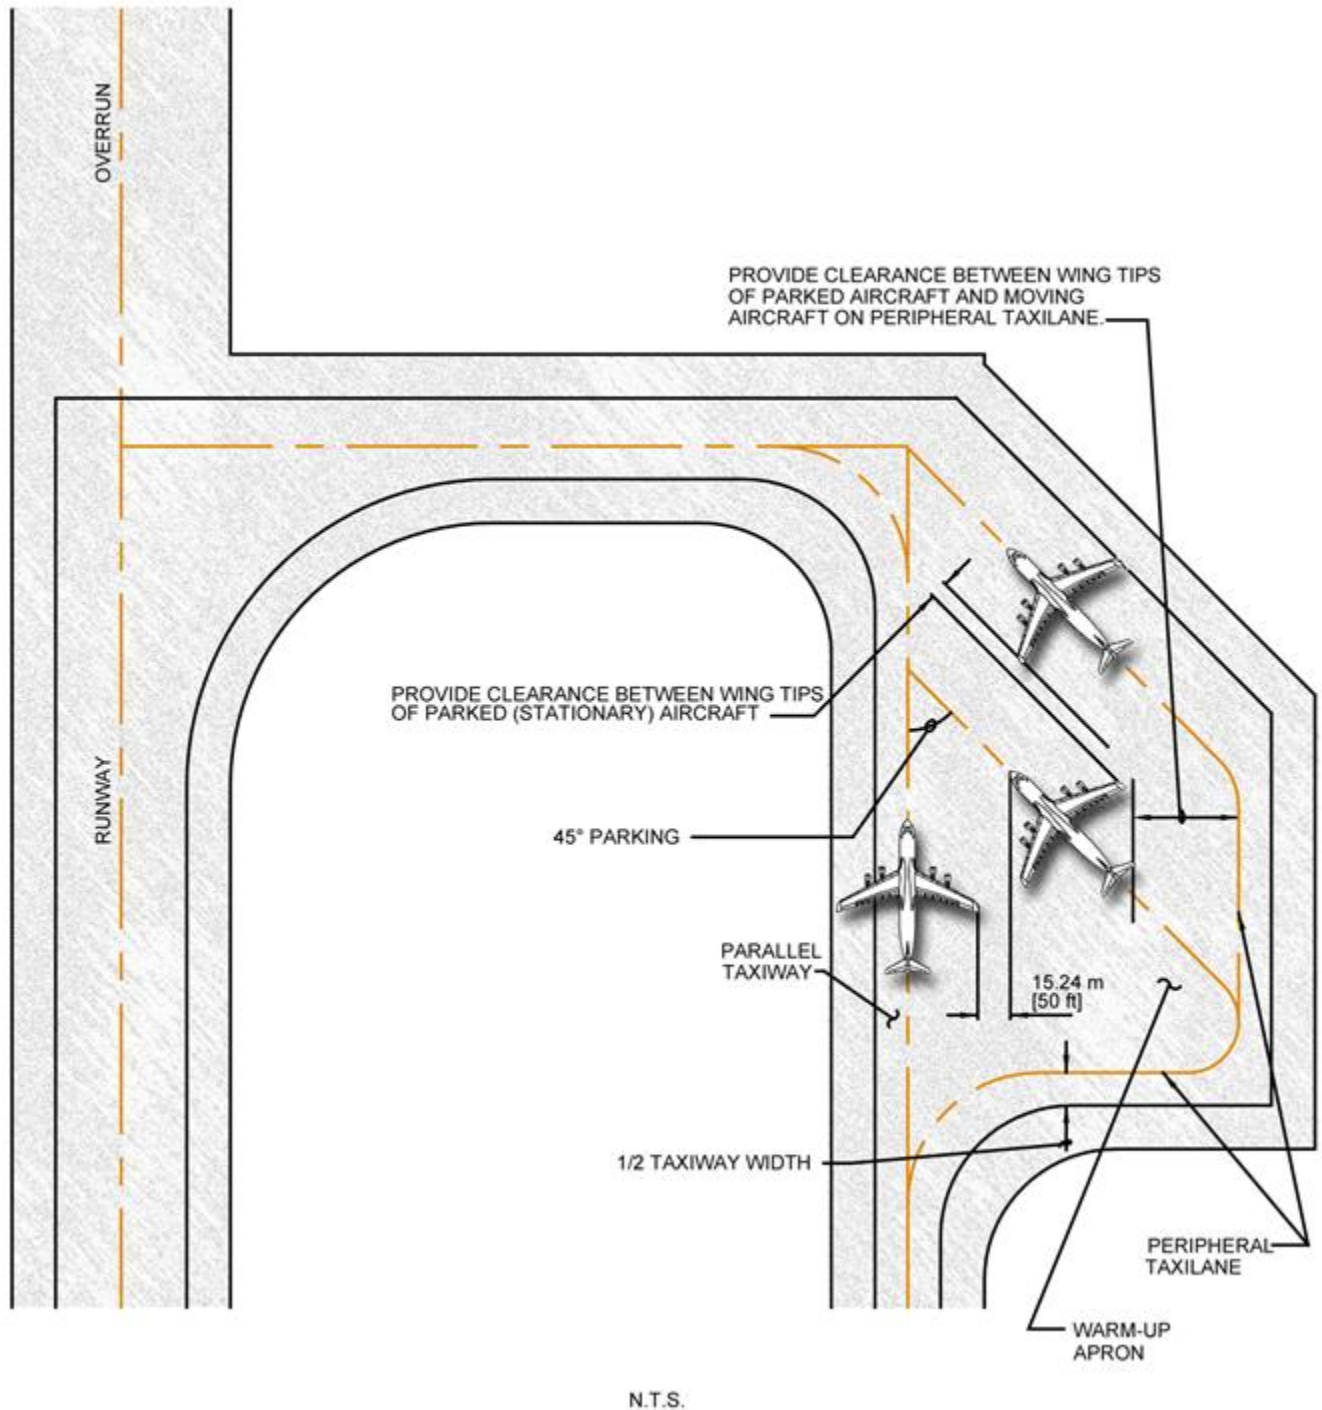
Warm-Up Pad Taxiing and Wingtip Clearance Requirements.
